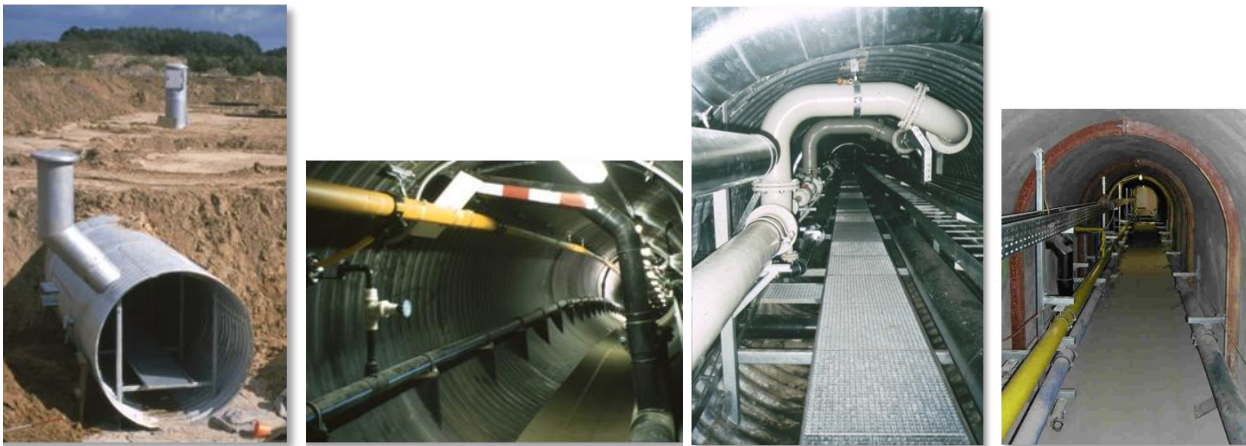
Steel Culvert Construction. Fig. 9 PEHD outfitted. Fig. 10 Steel Culvert outfitted. Fig. 11 Fibre Concrete outfitted. Pictures Axel Laistner and Hermann Laistner 1993 to 2004 – use of fibre concrete was developed together with and implemented by Carl Dupré GmbH & Co KG
